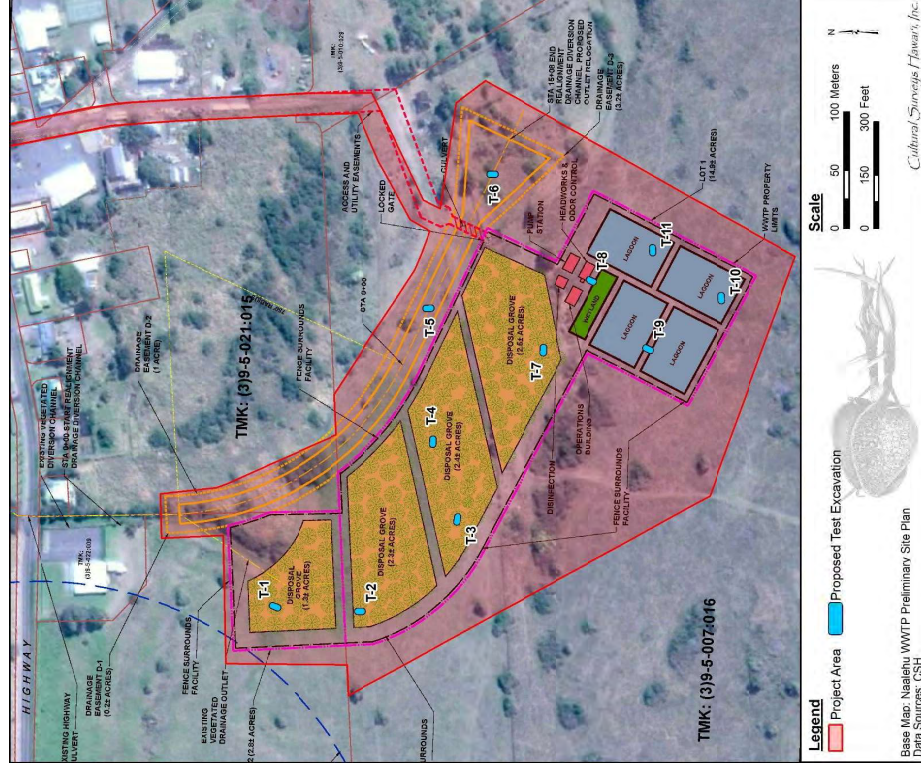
Client provided map showing approximate proposed locations for 11 test excavation trenches at the proposed wastewater treatment facility site at TMK: (3) 9-5-007-016
